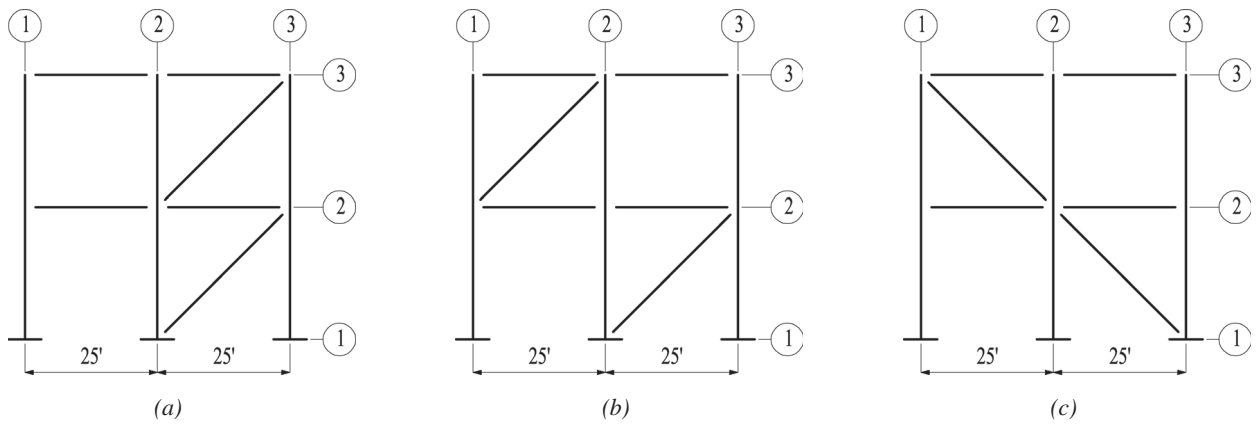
Elevation along lines A and B. (a) Bracing arrangement 1. (b) Bracing arrangement 2. (c) Bracing arrangement 3.
